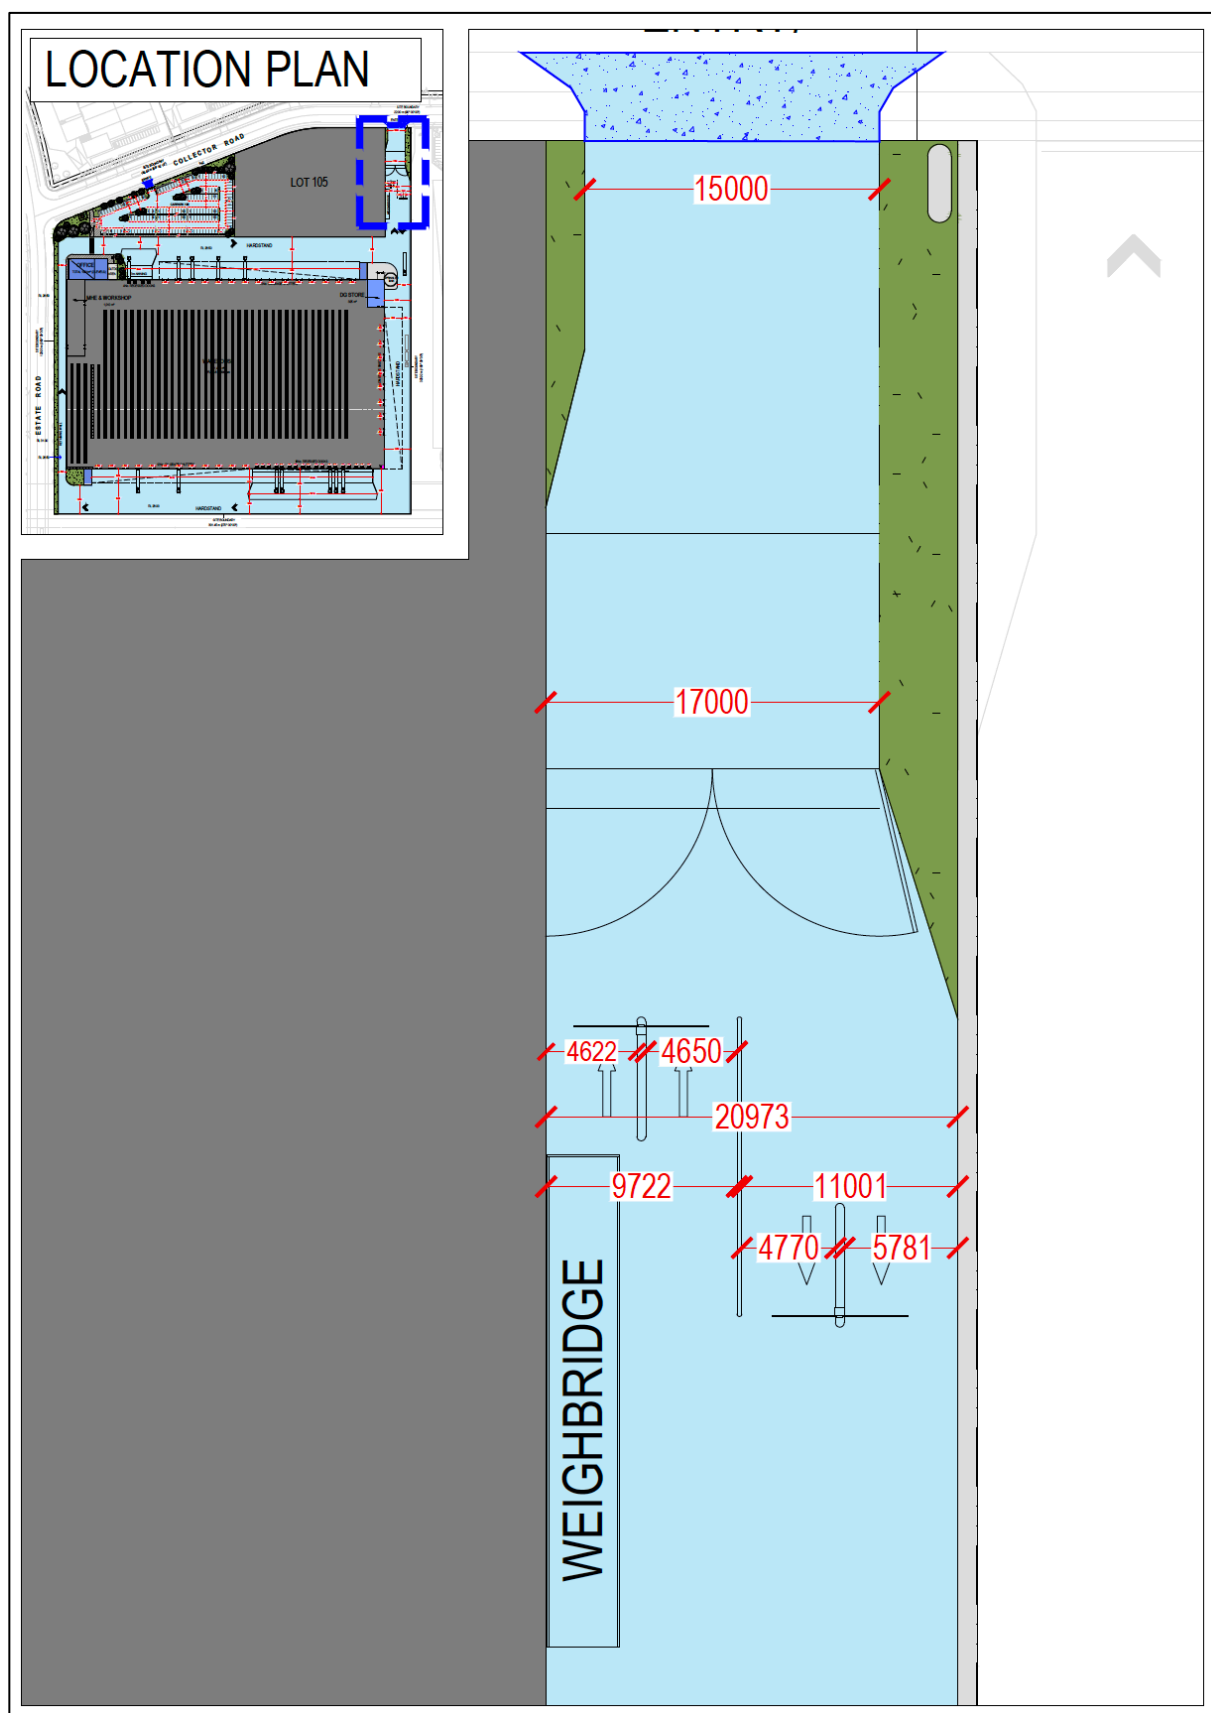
PROPOSED CAR PARKING LAYOUT AND DIMENSIONS
